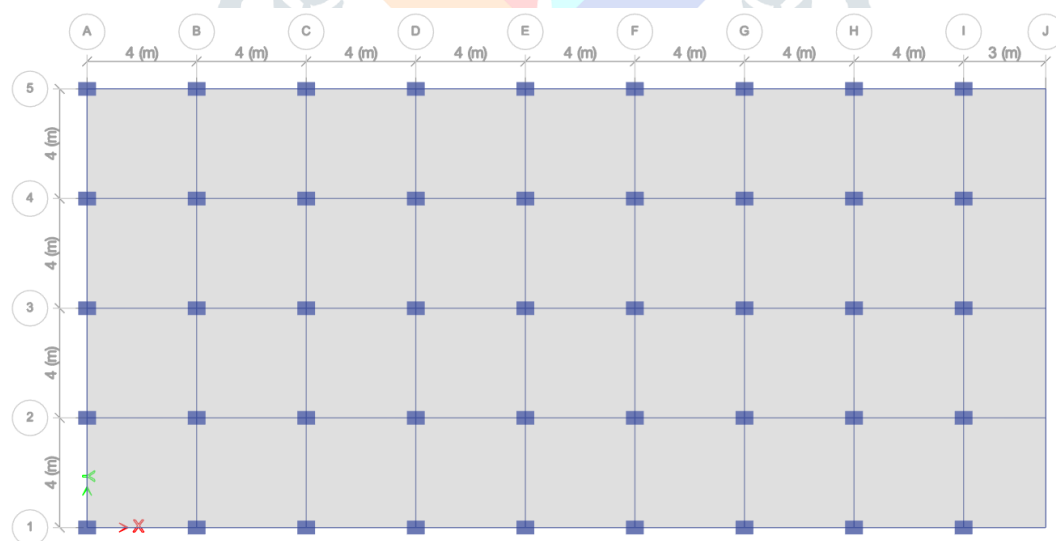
RCC Frame with Single-Sided Cantilever projection
